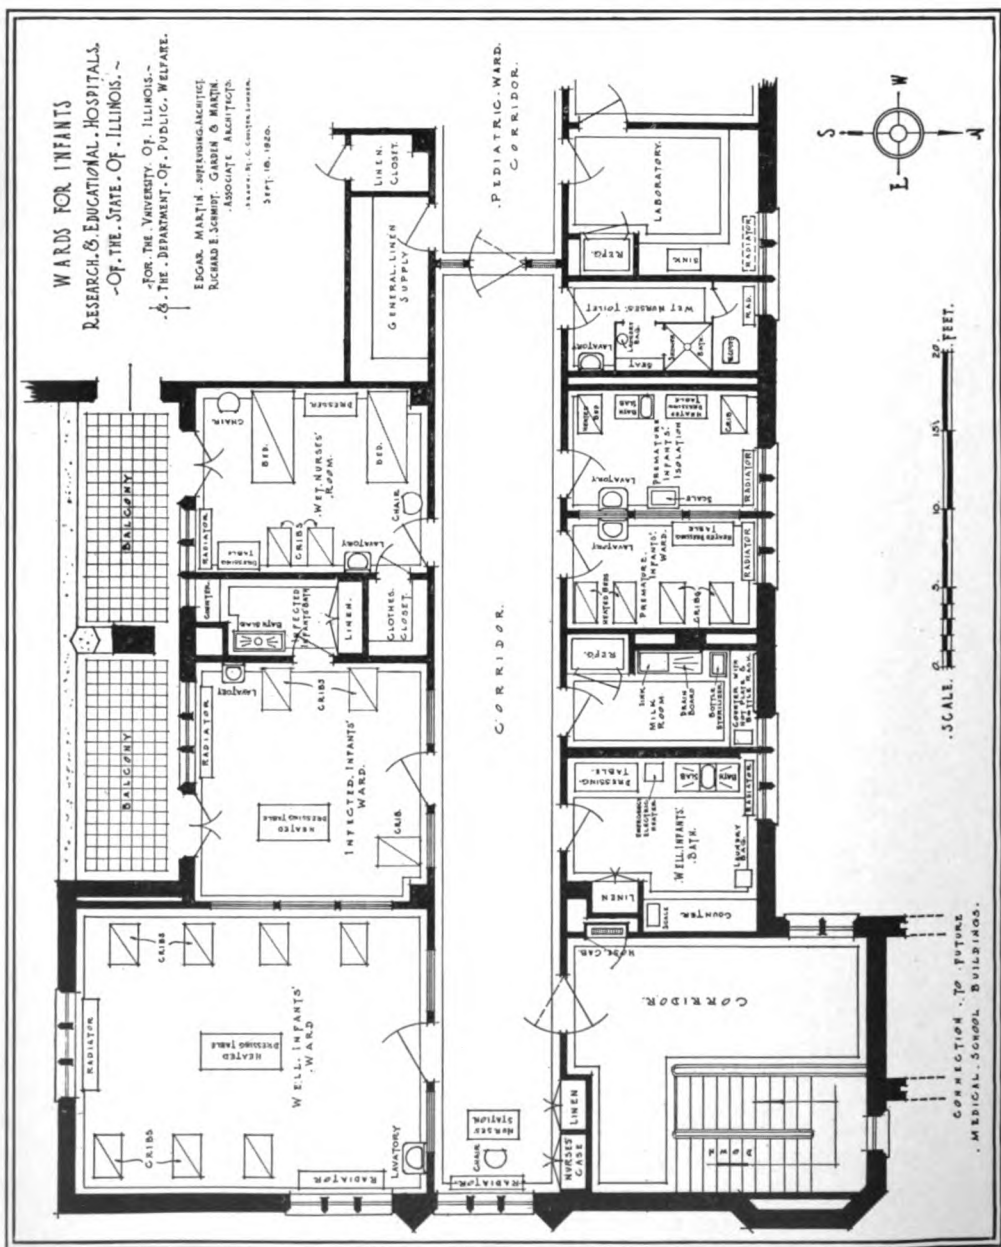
Floor plan of infant ward for a general hospital with limited floor space. Wards for infected infants are equipped for complete isolation.
